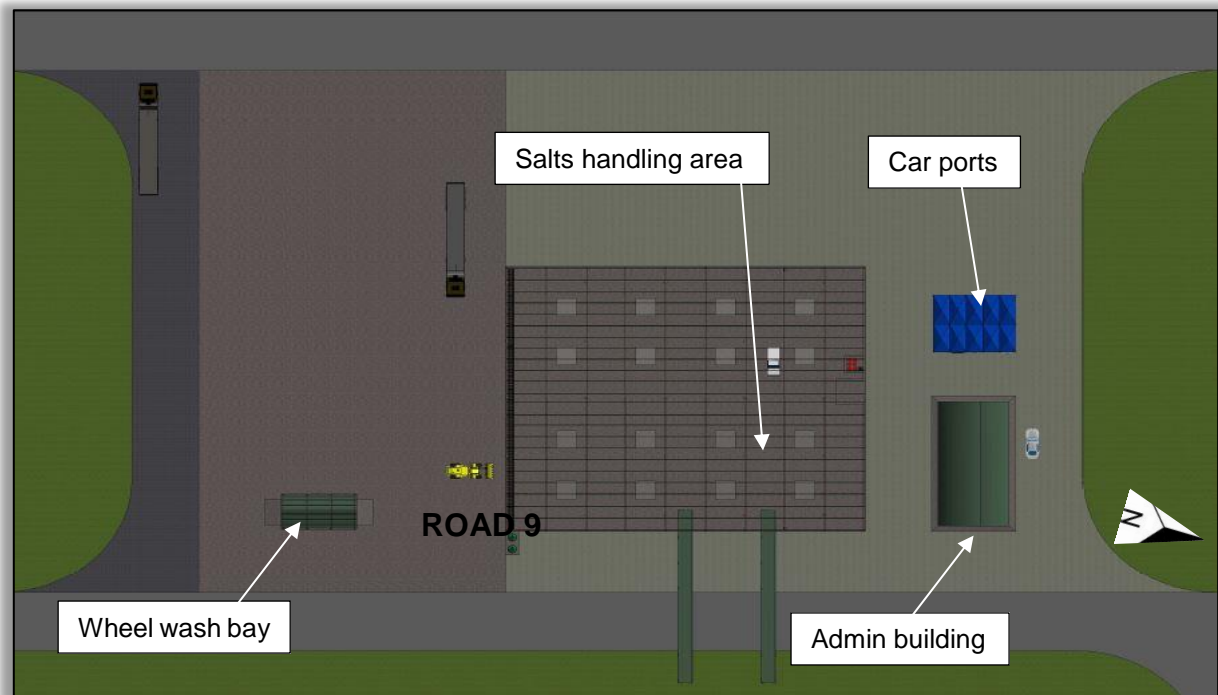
Layout of waste handling and storage facility – Salts Option 2
